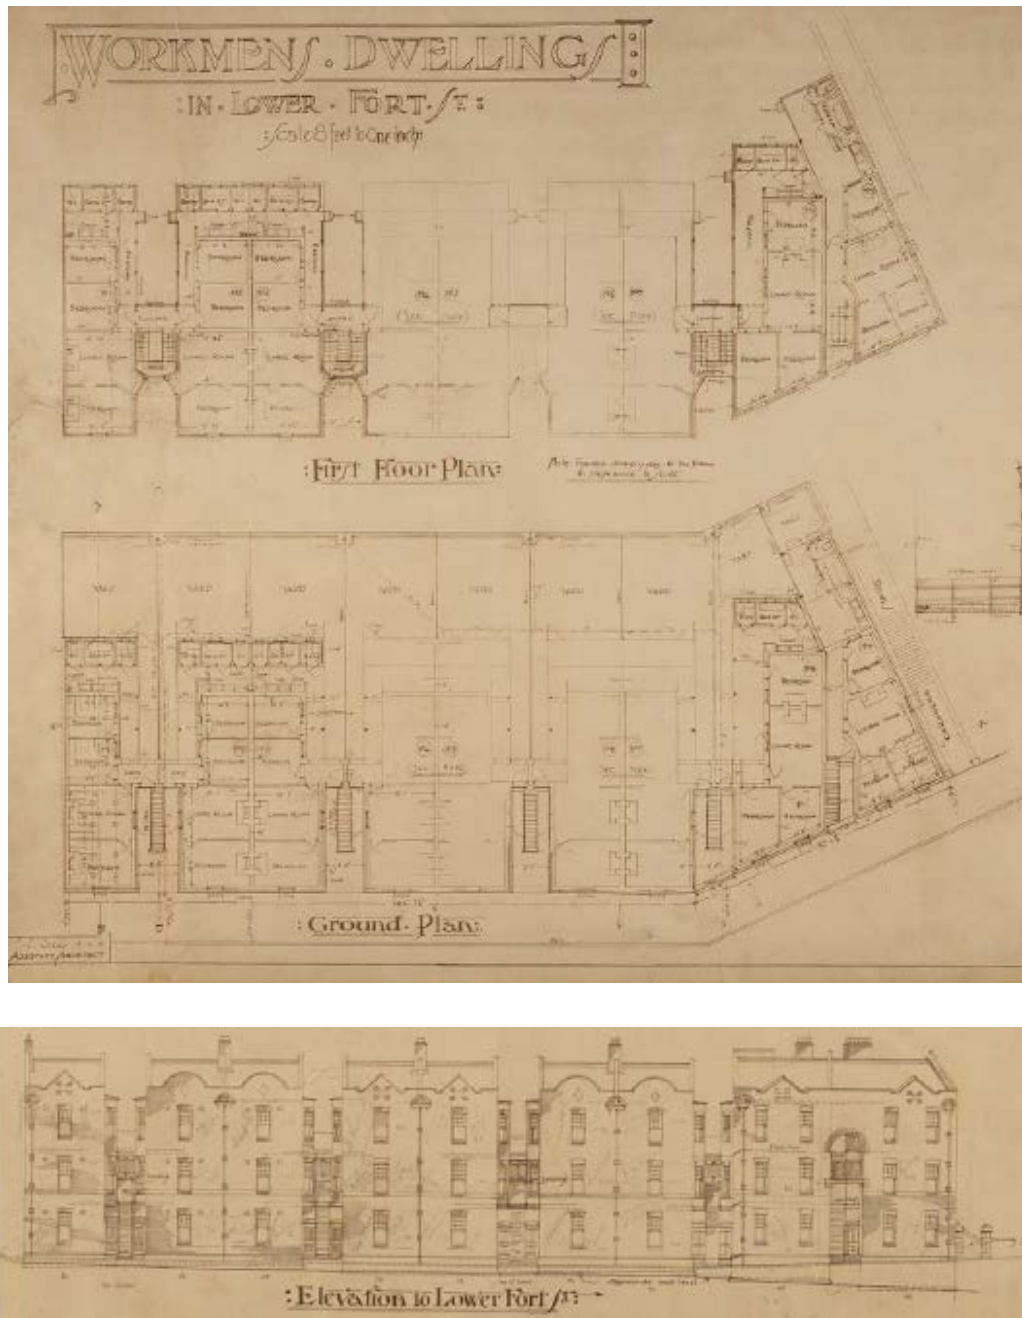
Plans and elevation for Workmen's Dwellings, 30-42 Lower Fort Street and 2-4 Trinity Street, Millers Point designed by the Government Architects Branch, NSW government Architect, Vernon, built 1910.
